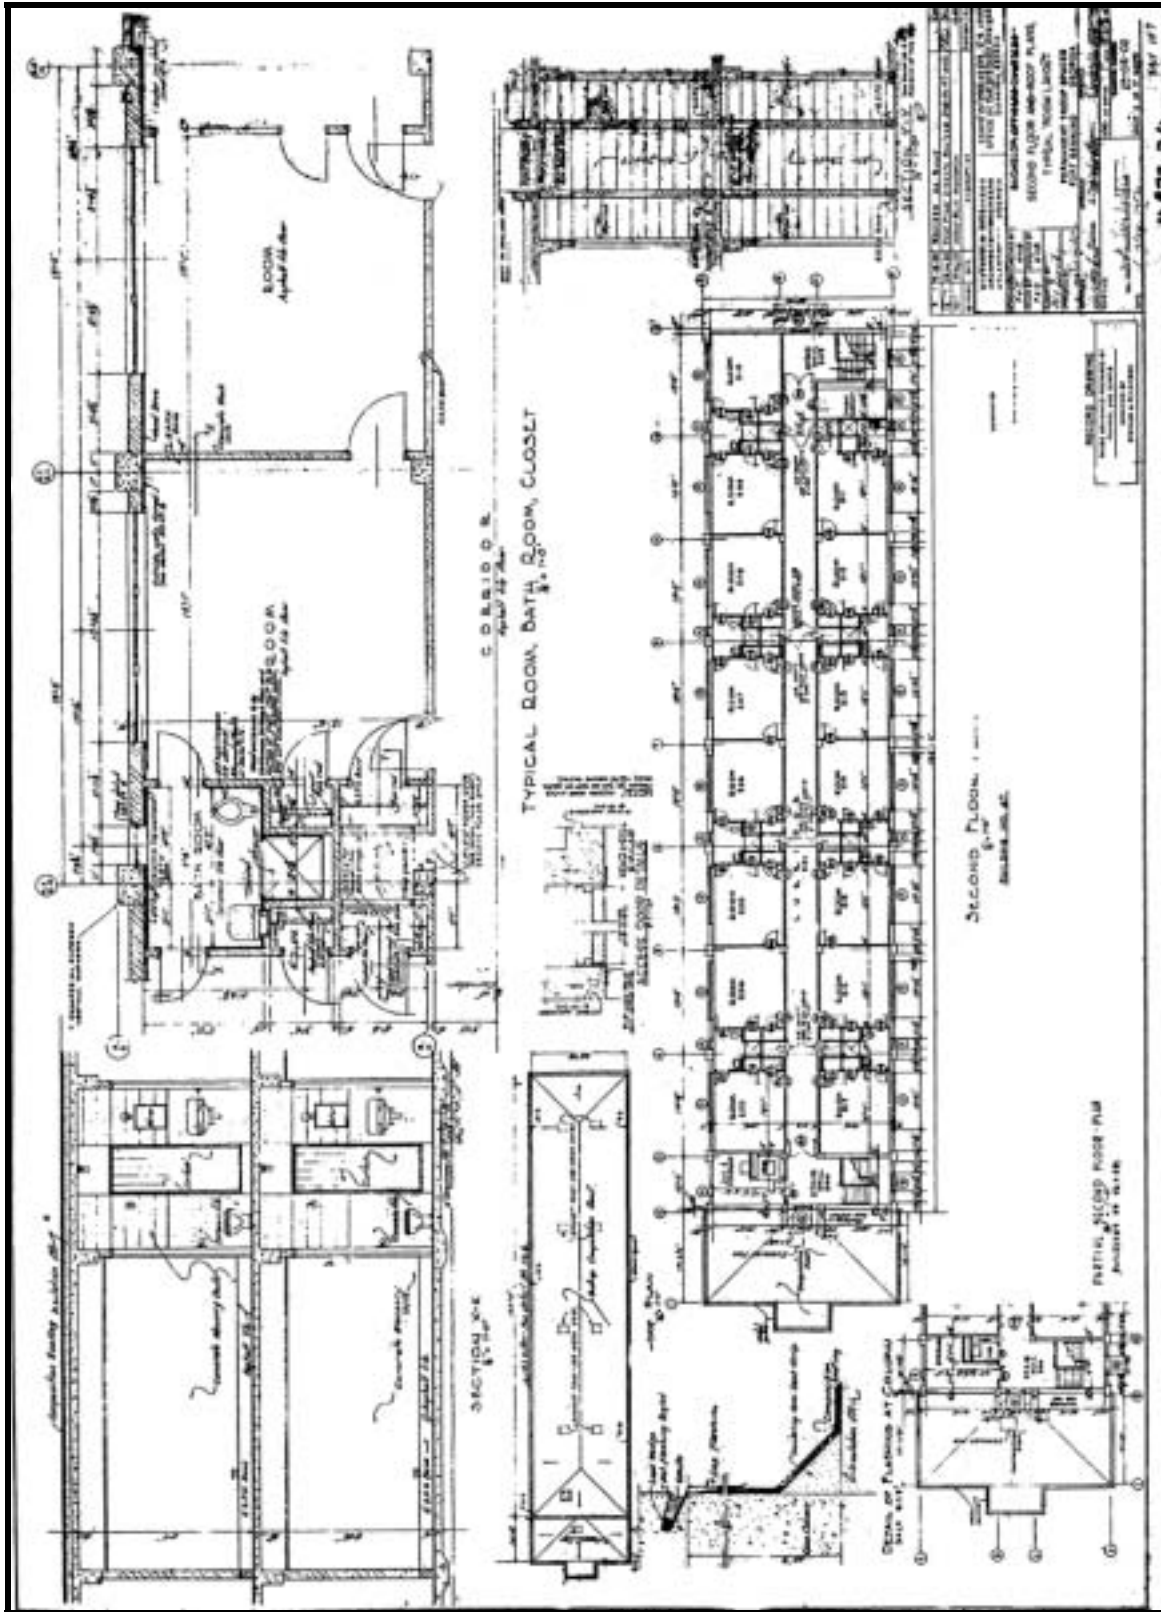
Two-story, hammerhead BOQ, second floor plan and typical room layout, Ft. Benning (1952, revised 1953) (Engineering, Ft. Benning).
